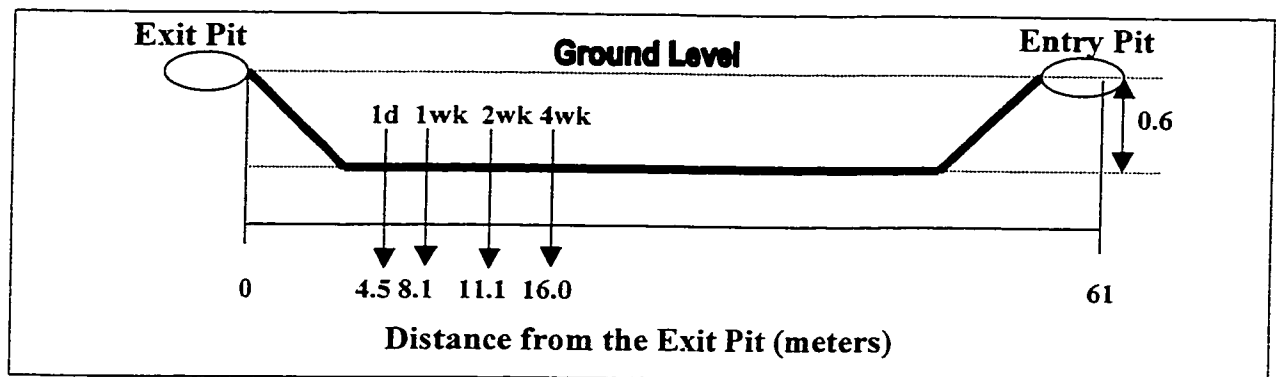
Elevation View of 100mm Pipe Installation in Clay
